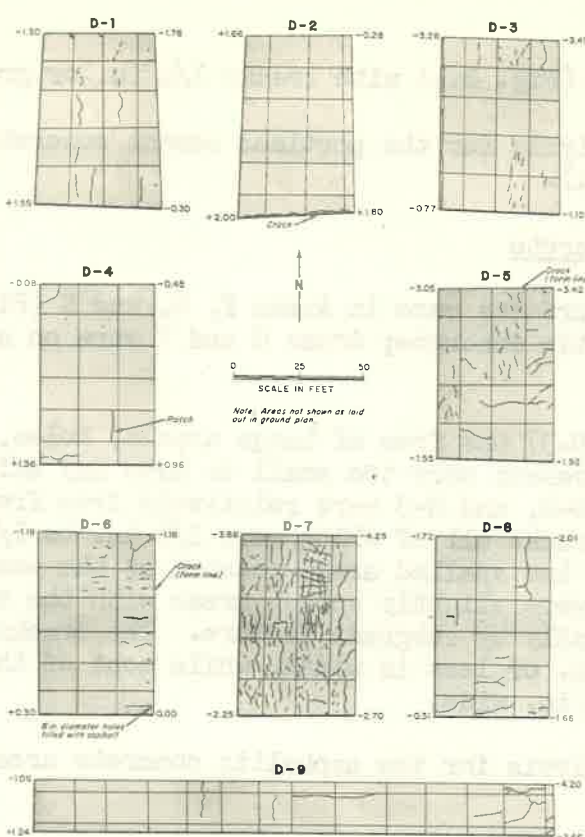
Slopes, Form Lines, and Cracks in Area D, Portland Cement Concrete.
